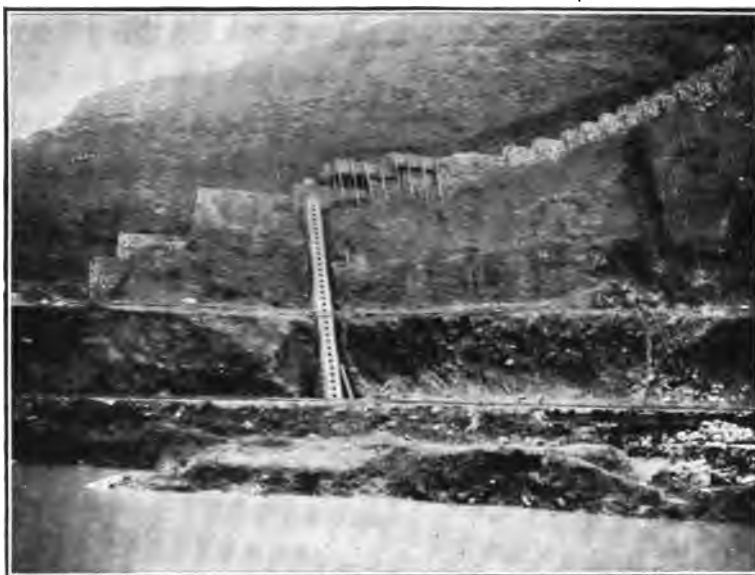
NECAXA DAM. INCLINED PIPE WITH PERFORATIONS FOR DRAINAGE OF WATER AFTER SETTLEMENT OF SLUICED MATERIAL ON DAM. ALSO CORE-WALL AS COMPLETED.
